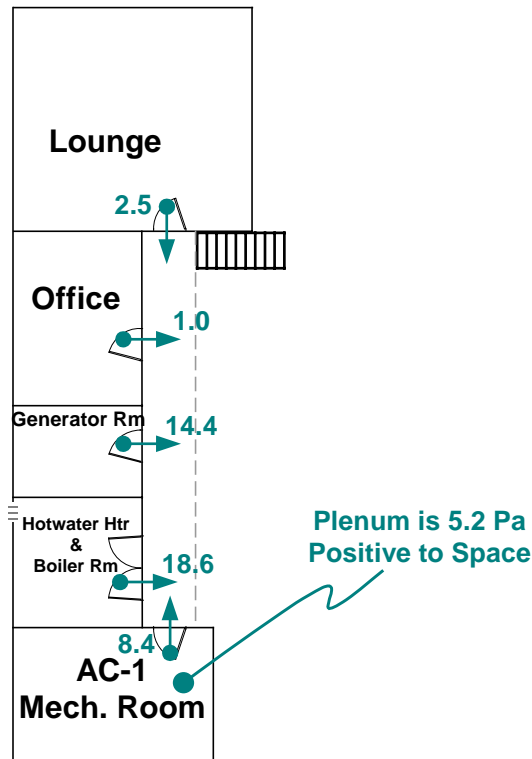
Second Floor Pressure Differences between Rooms with East Garage Exhaust On (EF-2)
